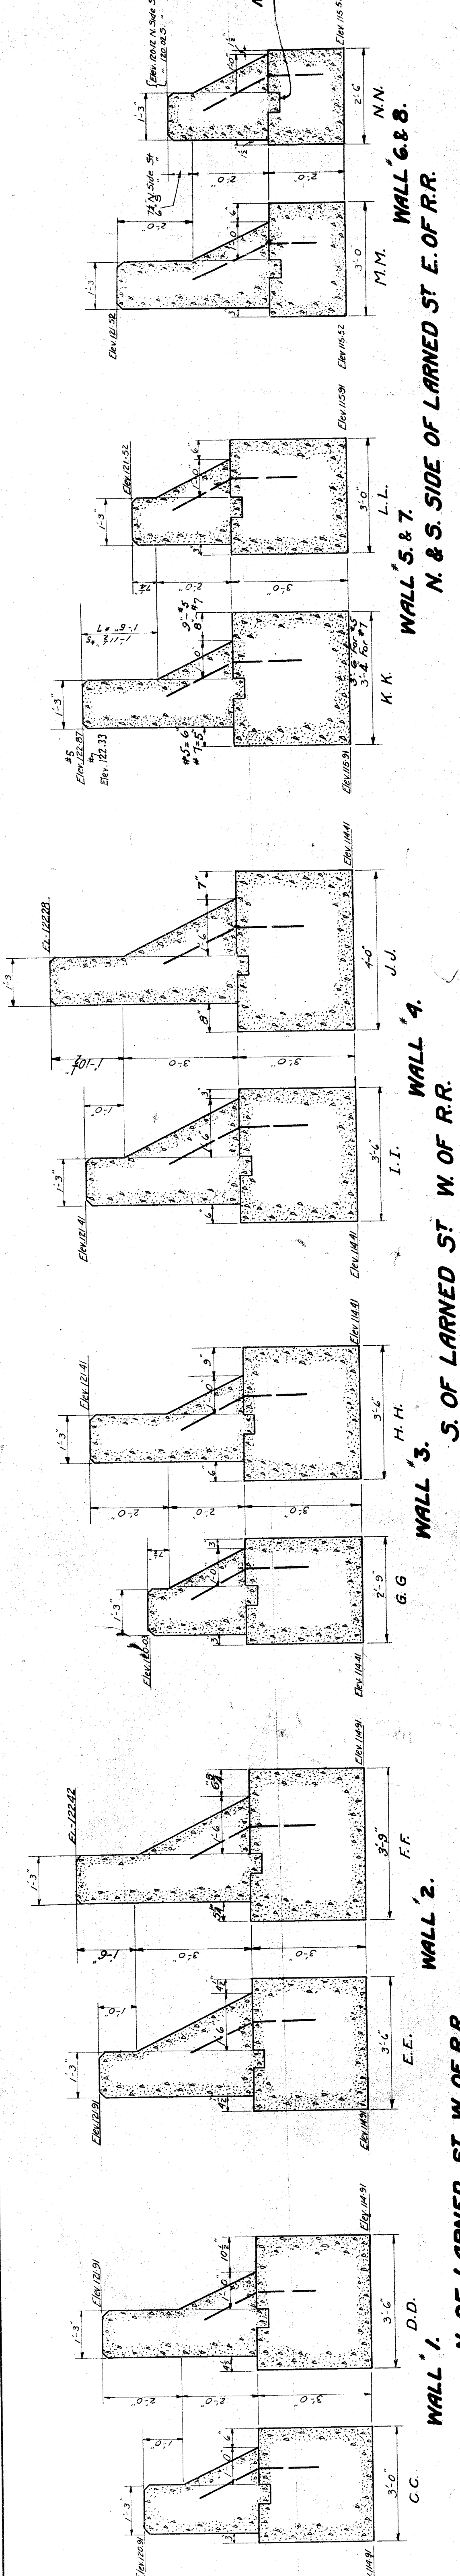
DETAIL CONCRETE BACKING AND FOUNDATION FOR CURB
